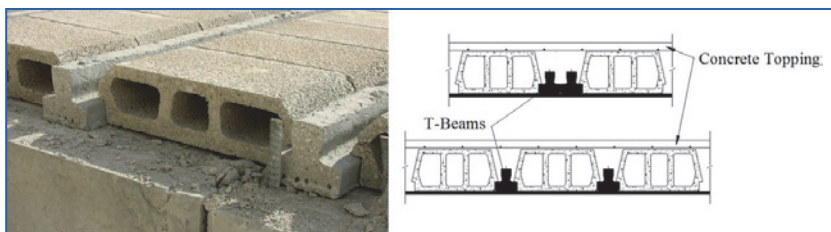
T-beam and block flooring (Ballut Blocks, 2014) [4].
